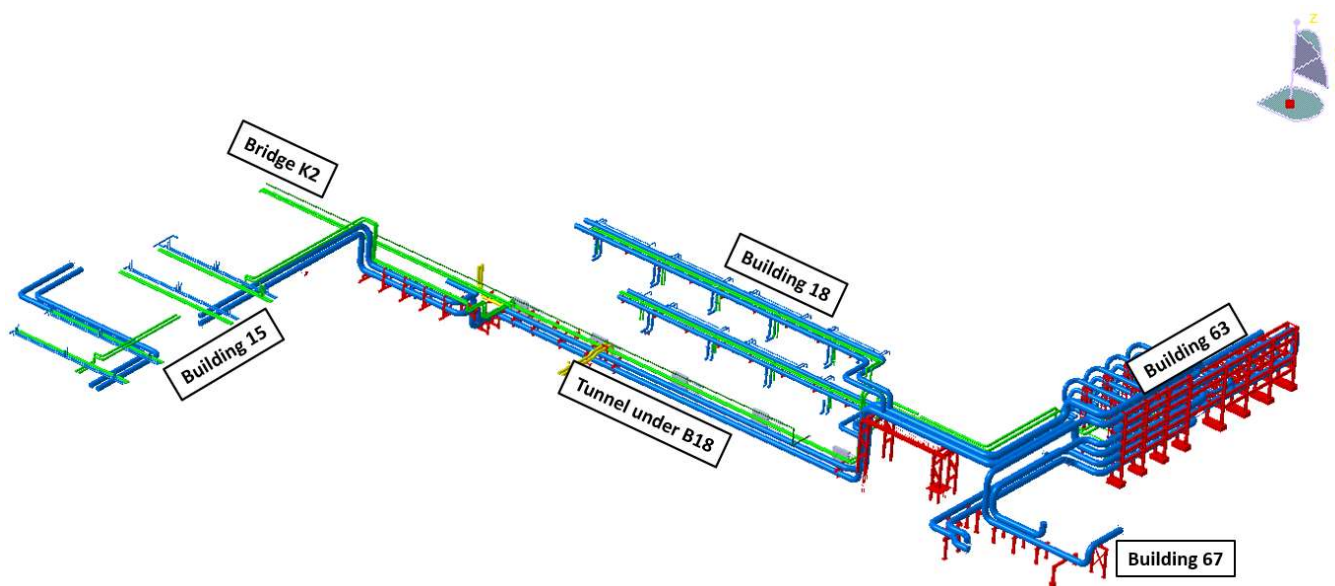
Piping Routing of CCWS-2F and CHWS-H4
